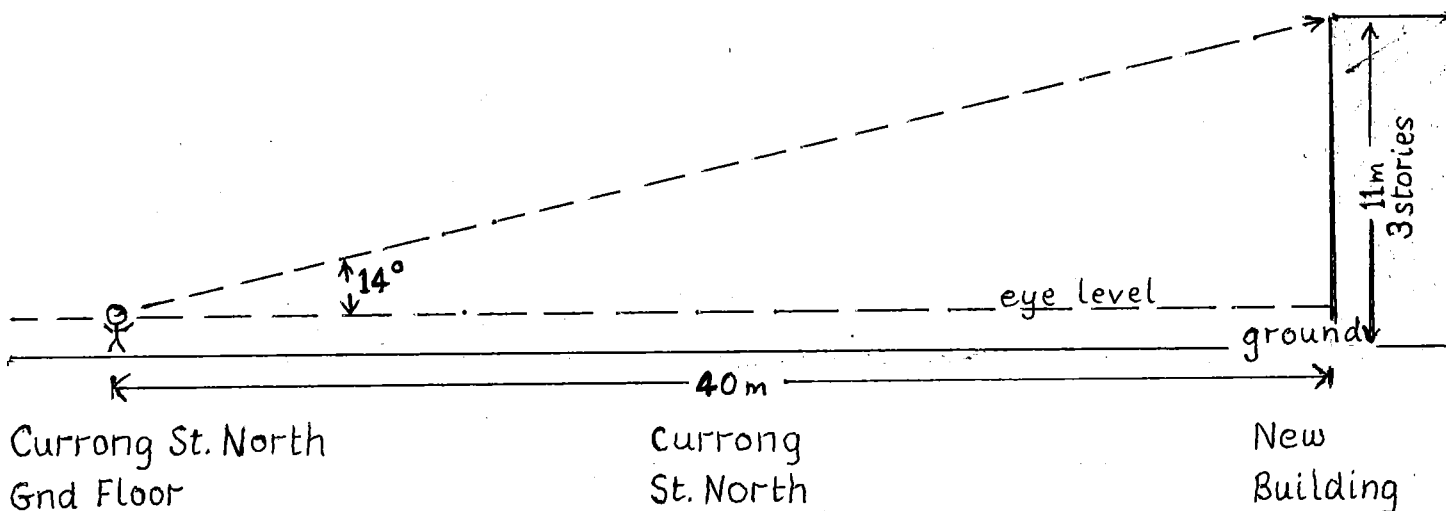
Line of site of top of proposed new buildings as seen by an existing resident of a single storey house on Currong Street North (east side).
